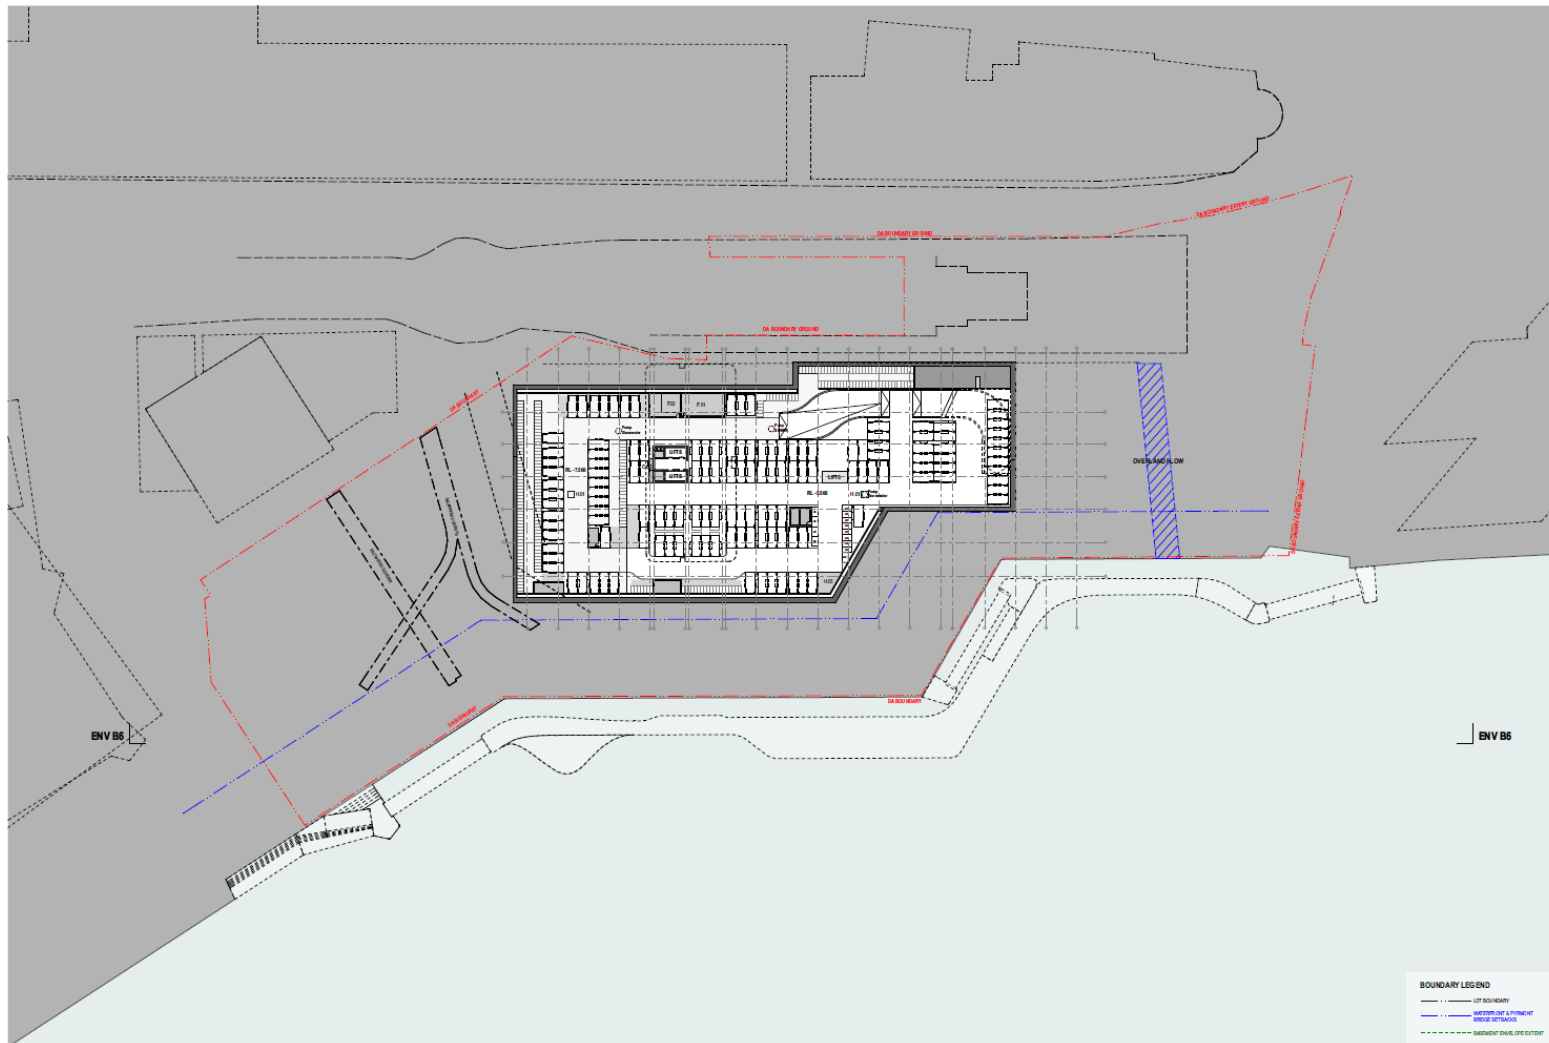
Basement 3 – Indicative Plan Only (Source: FJMT, 2020)
